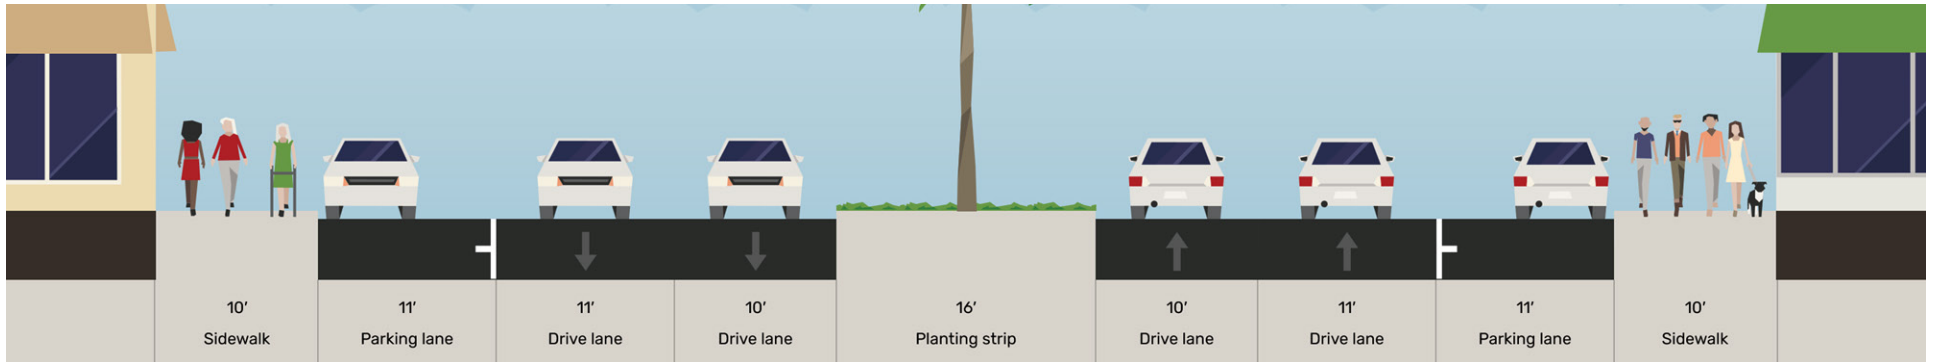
Existing cross-section: Crenshaw Blvd from El Segundo Blvd to Rosecrans Ave
